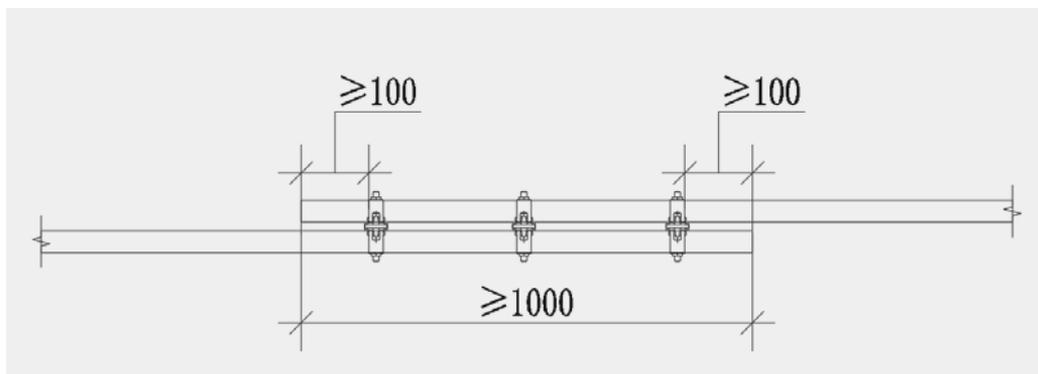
Steel Tube Overlap Installation Diagram
